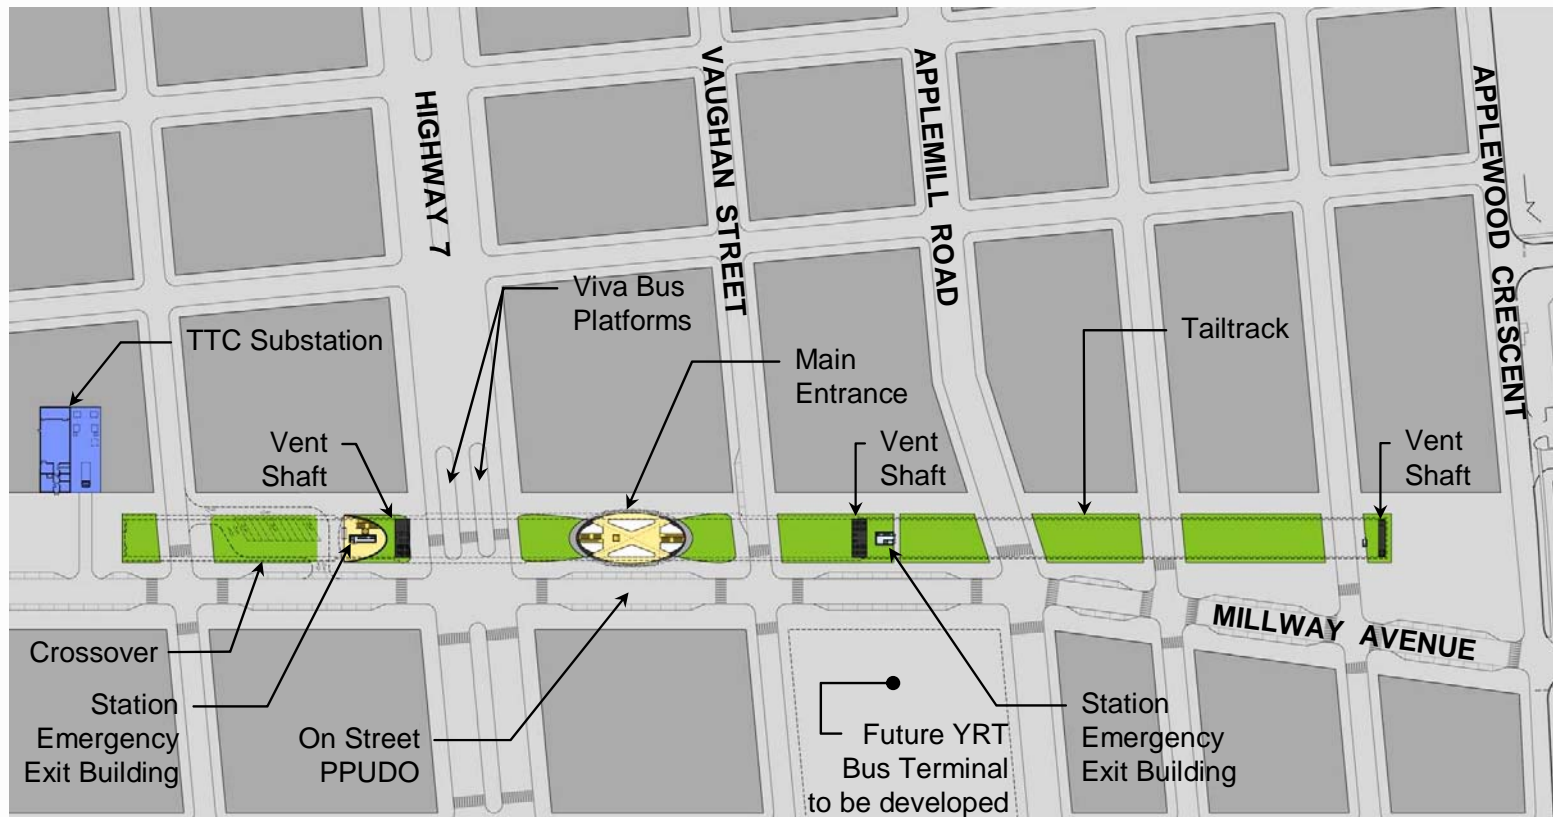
Site Plan - with Proposed Transit Oriented Development
